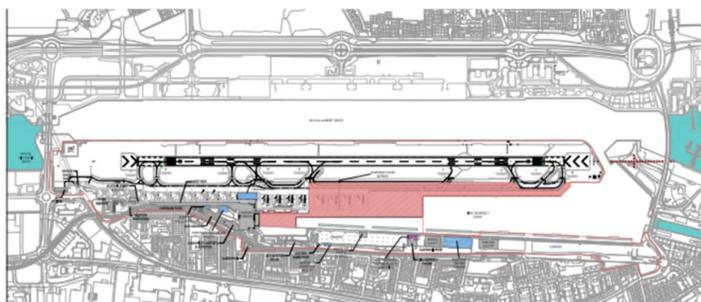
2022 CADP1 Site Plan (Full plan can be found in Appendix D)
